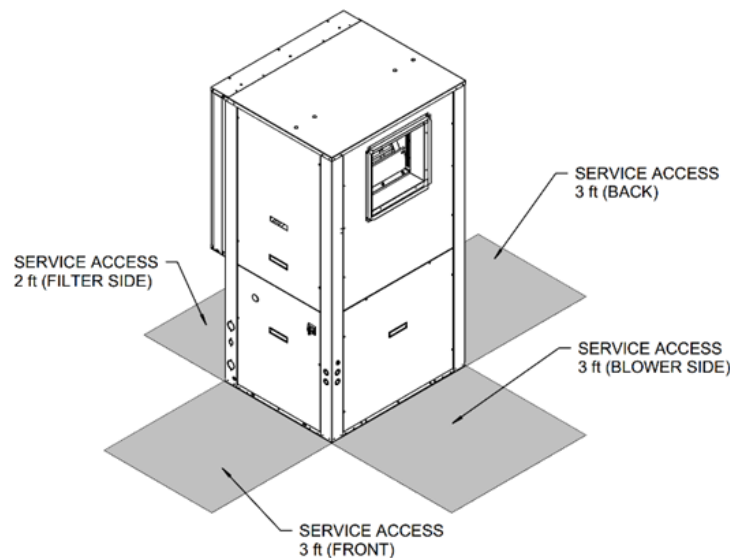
WSV6090 Side Discharge Clearance Requirements
